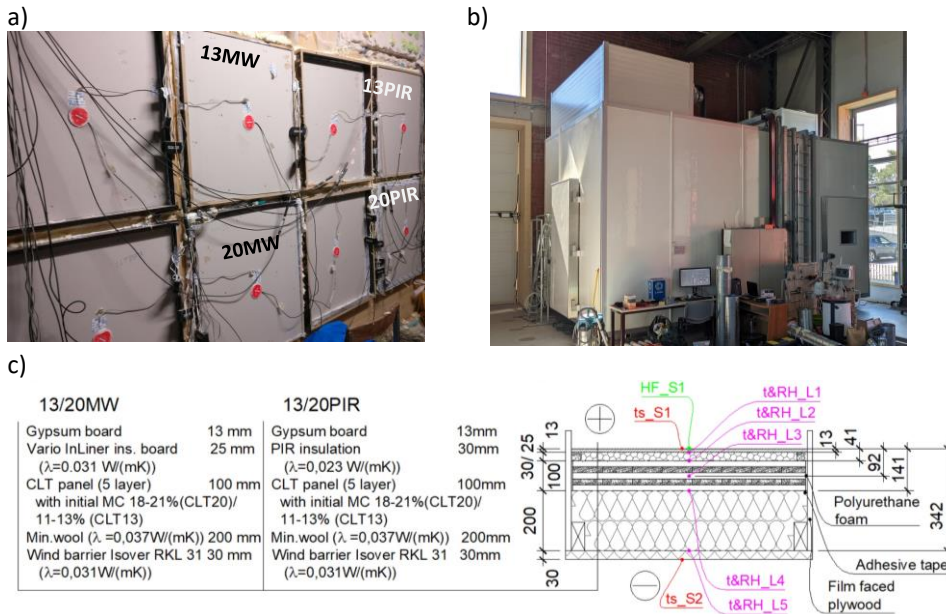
Interior view of the test walls (a) and cross-section of a climatic chambers (b); material layer lists of the test walls and placement of measuring sensors in the wall section (c).
